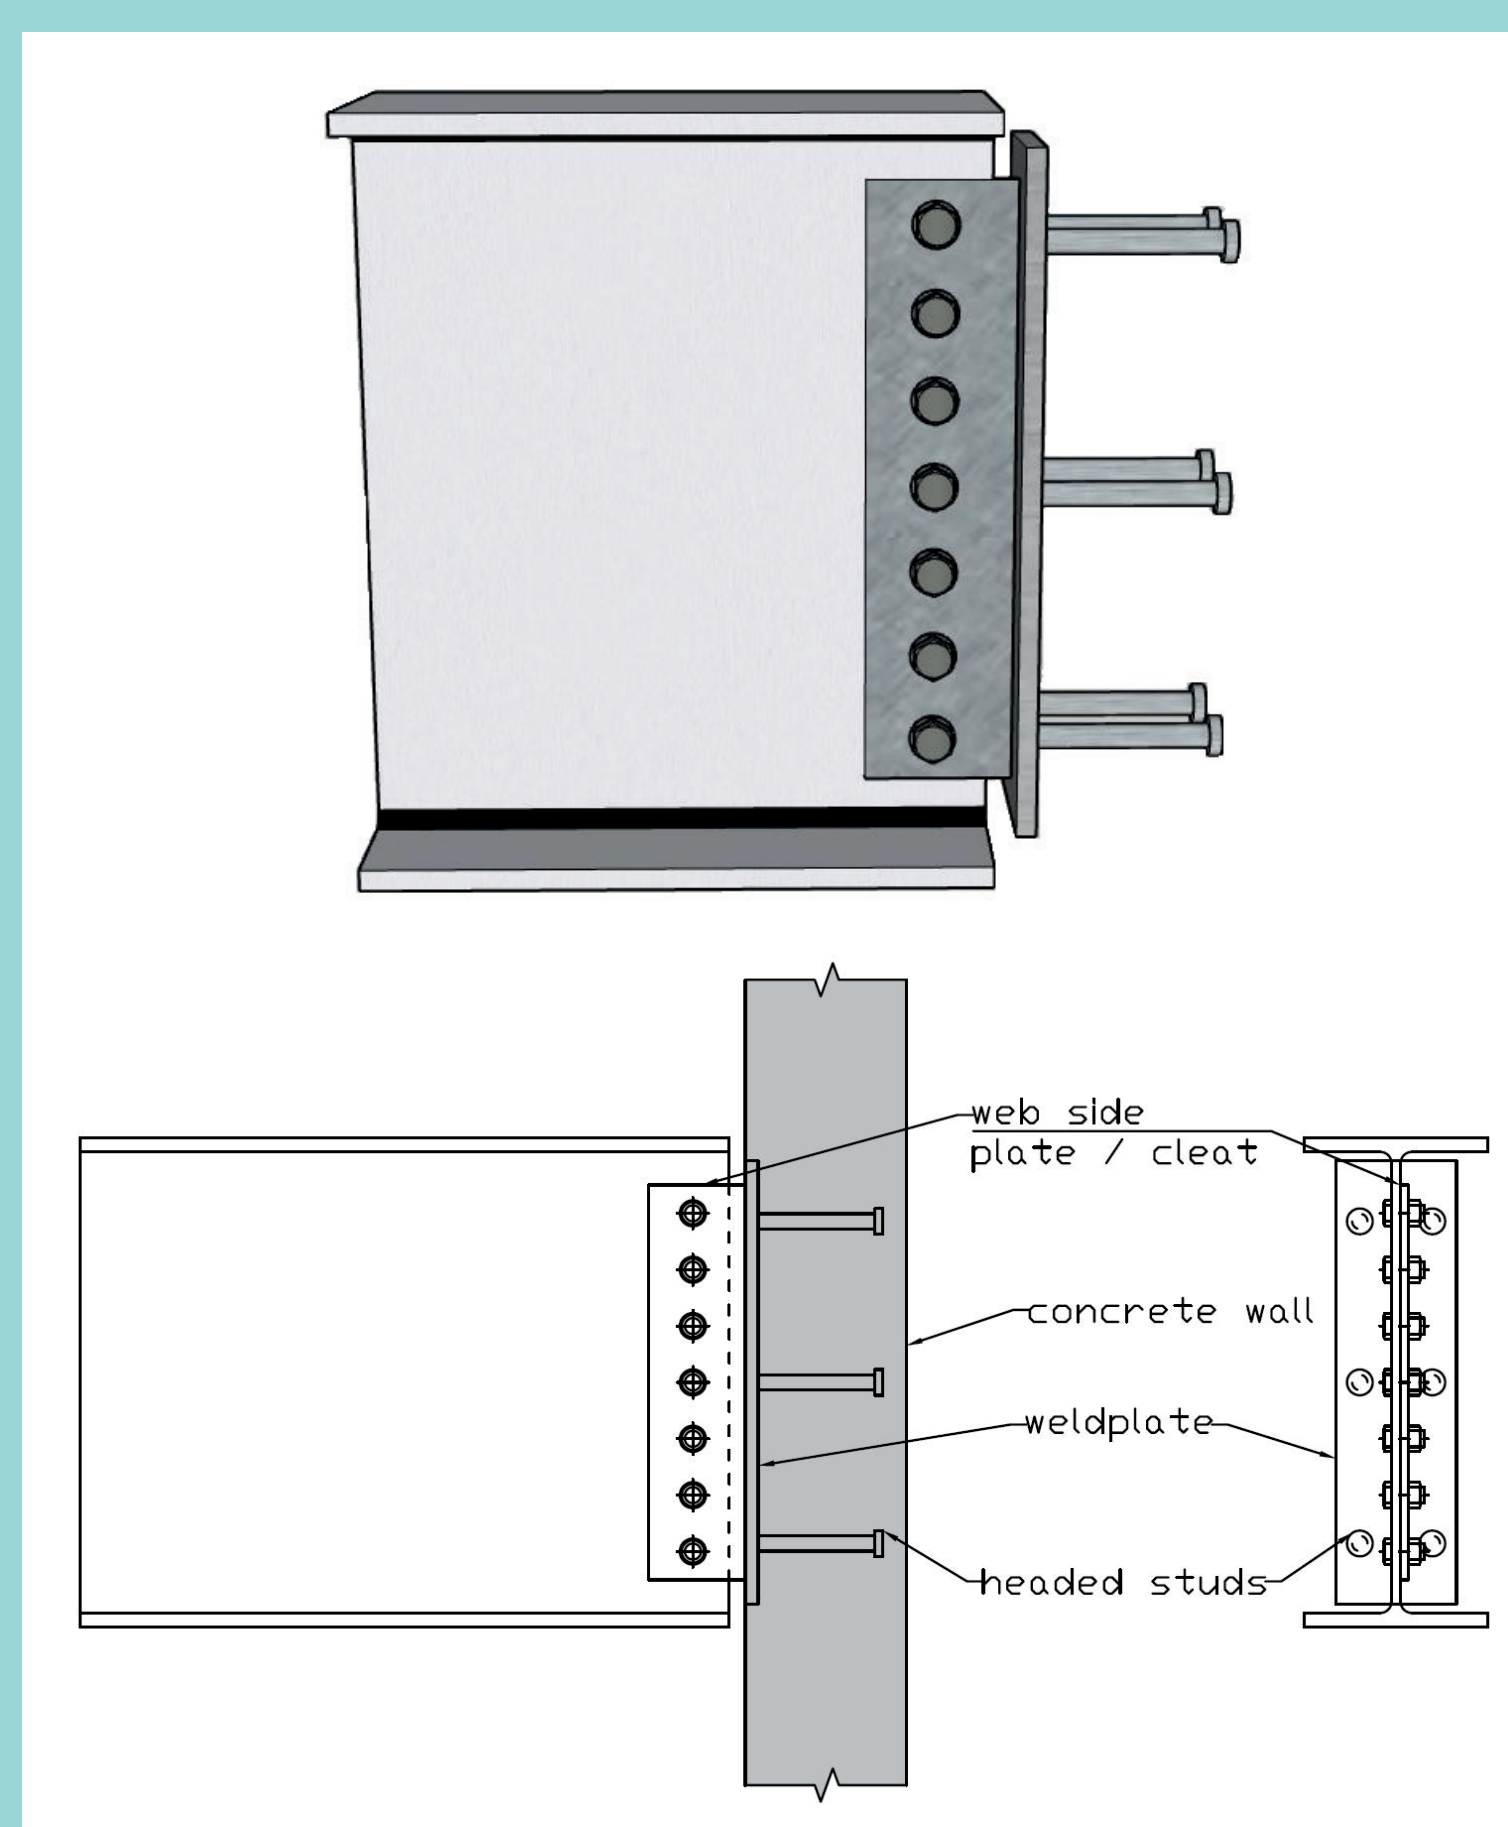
Typical concrete wall-steel beam connection detail consisting of headed studs and a single web side plate / cleat.
